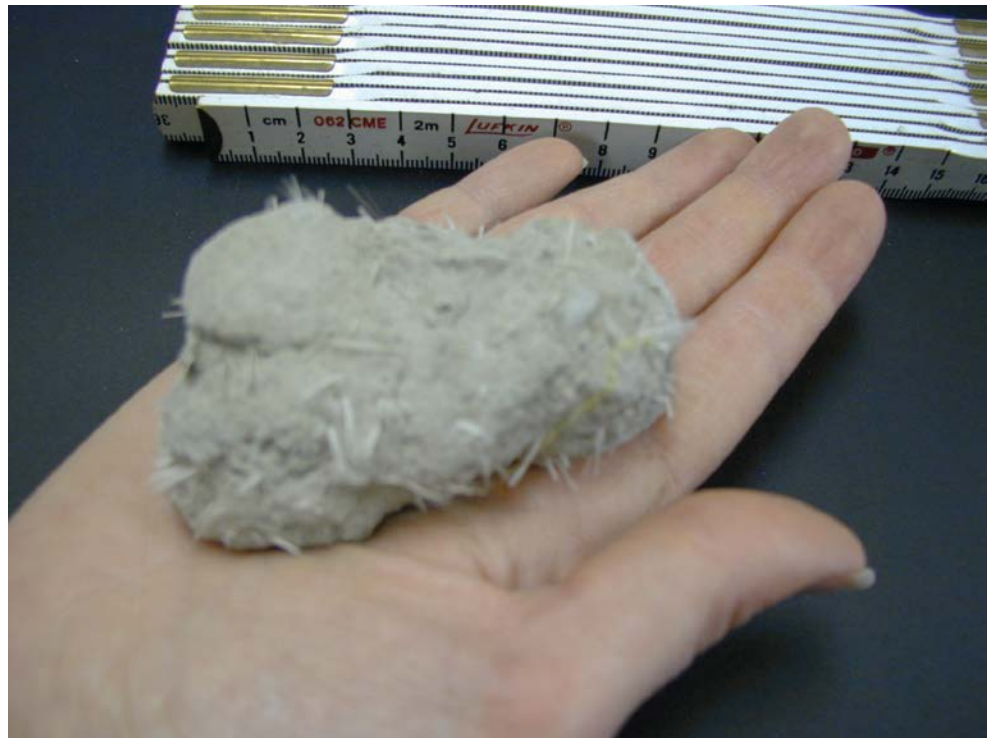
Fiber Reinforced Concrete (FRC)
